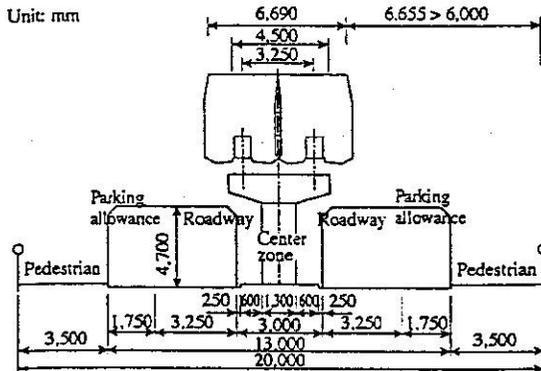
Cross Section Layout of Guideway Structure in Small-type Monorail System.
